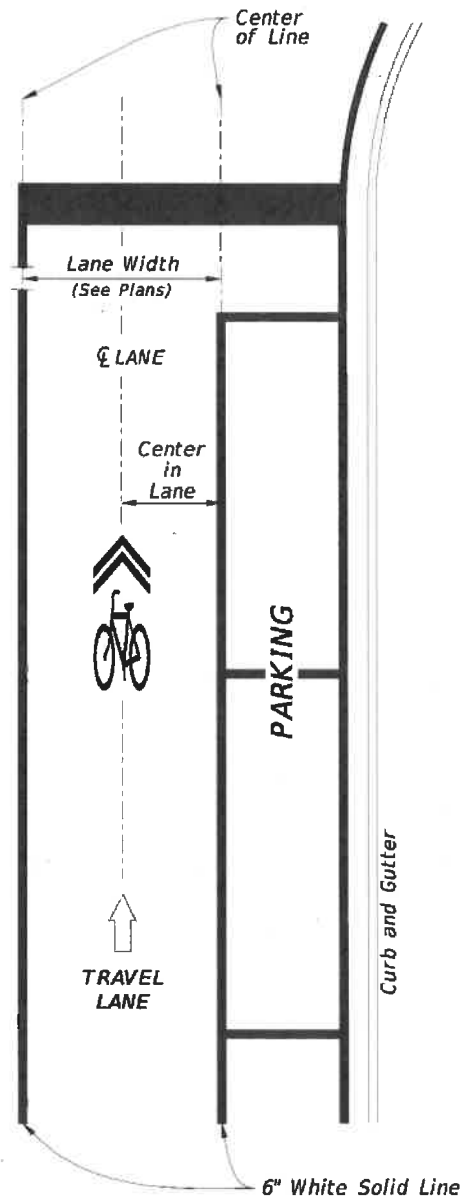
26 Shared Lane Marking Placement (With On-Street Parking)
